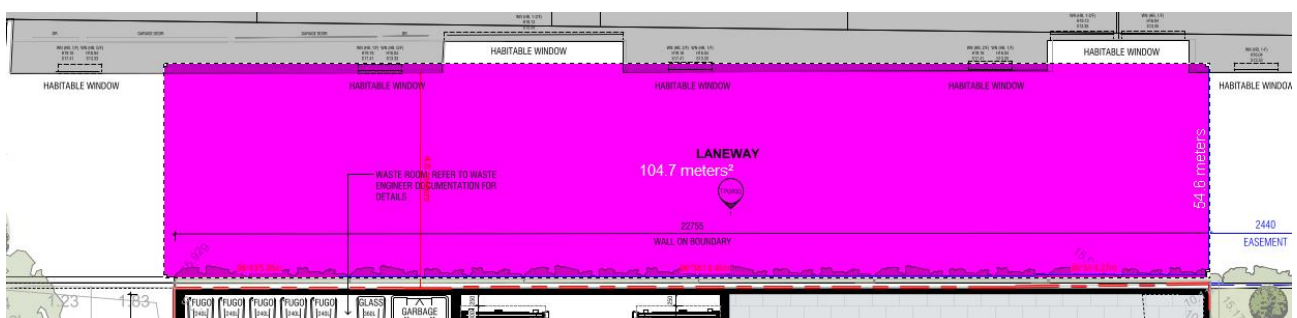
Officer mark-up of ground floor plan showing lightcourt to south-facing windows at No. 7 Sanders Place
